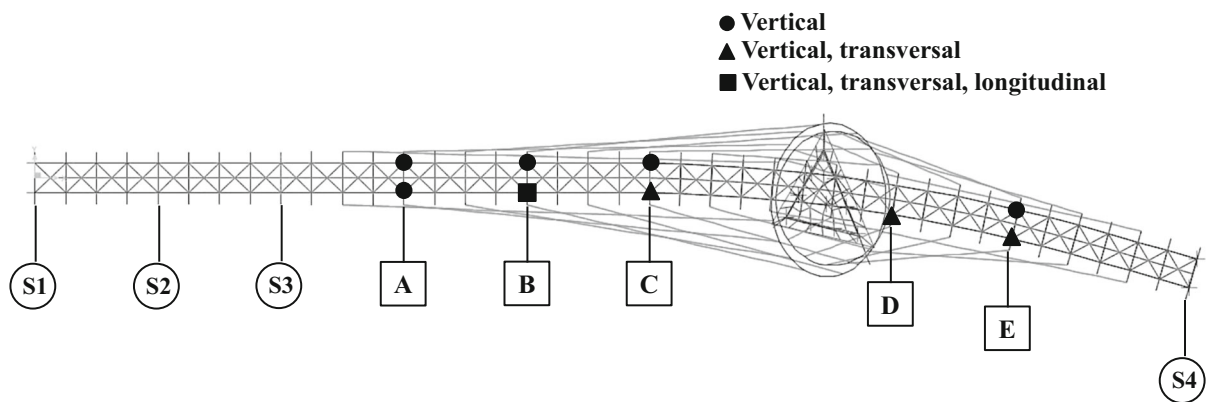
Plan view and measurement locations on the cable-stayed spans
